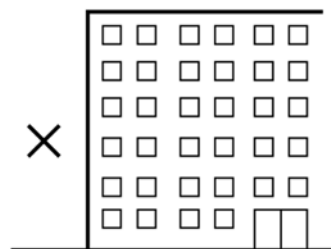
Monolithic façades 'hole in wall' must be avoided
